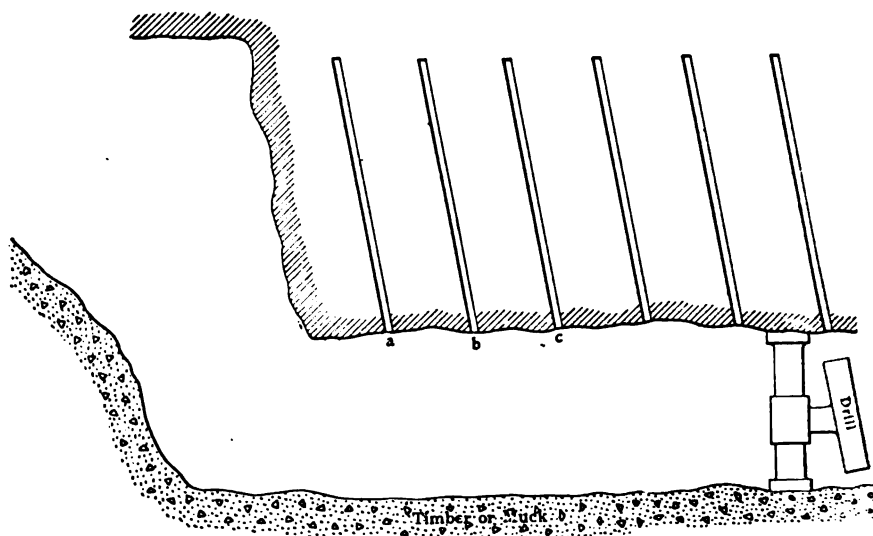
ARRANGEMENT OF HOLES FOR BLASTING WITHOUT REMOVING DRILL.
